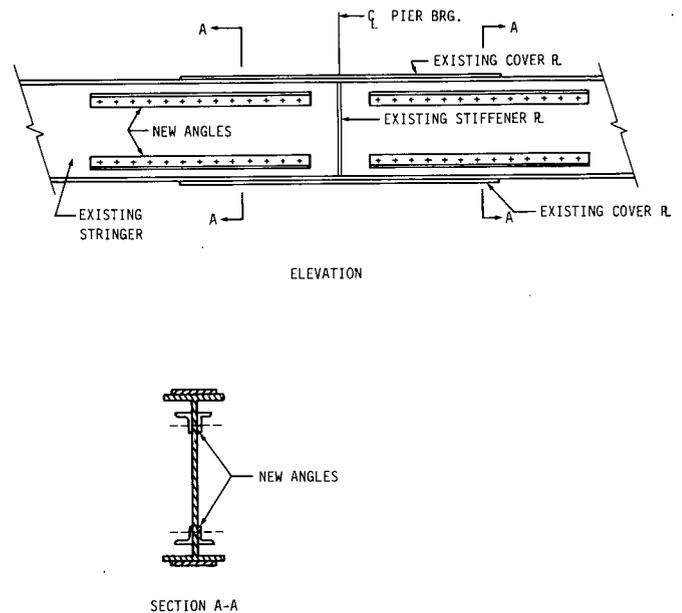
Iowa DOT method of adding angles to steel I-beams.
